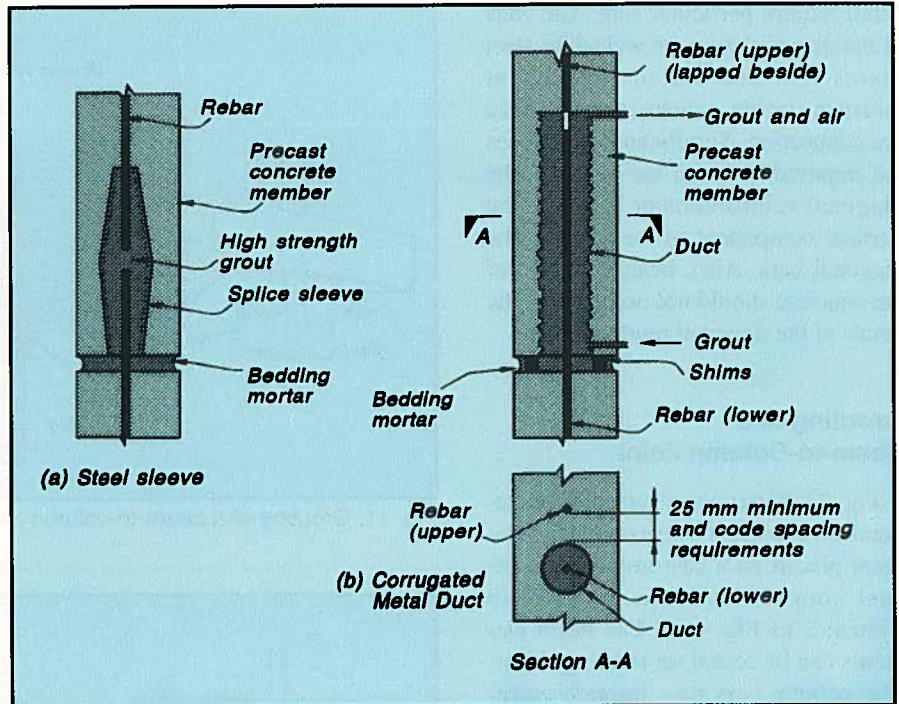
Steel sleeve splices and corrugated metal ducts used for column connections (Ref. 3).
